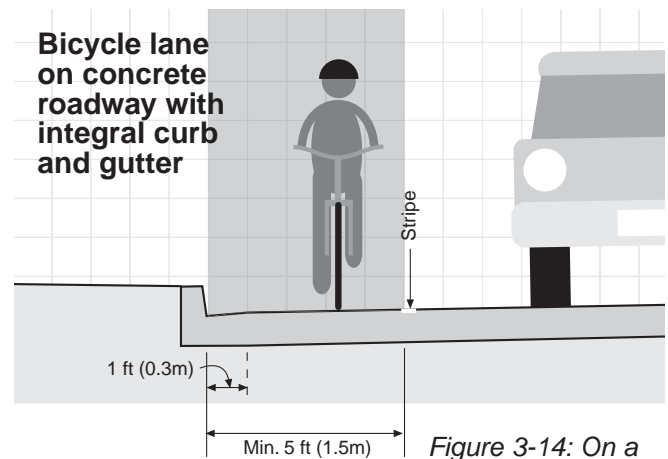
On a concrete roadway with integral gutter and travel lane, there is no gutter pan joint line. If a joint needs to be placed, it is best to locate it 1 ft. (0.3m) from the curb face.
